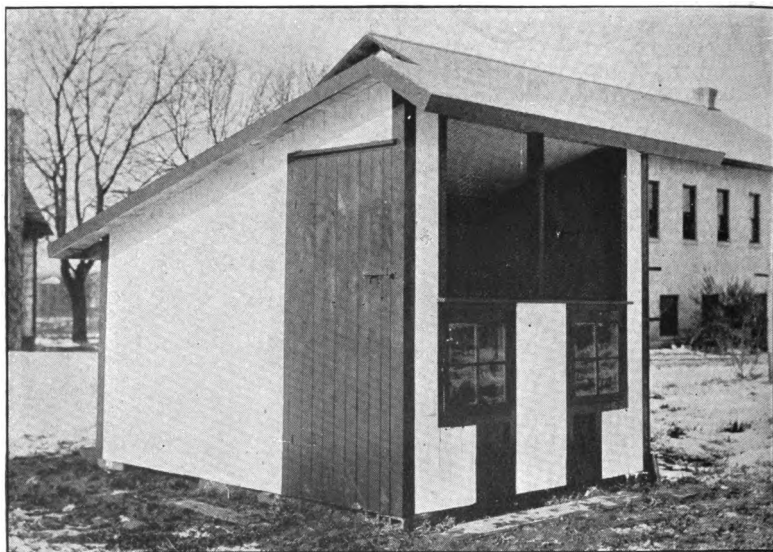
Vineland colony house. Note overhanging roof, the glass sash hinged under the muslin opening, and the very simple construction.
